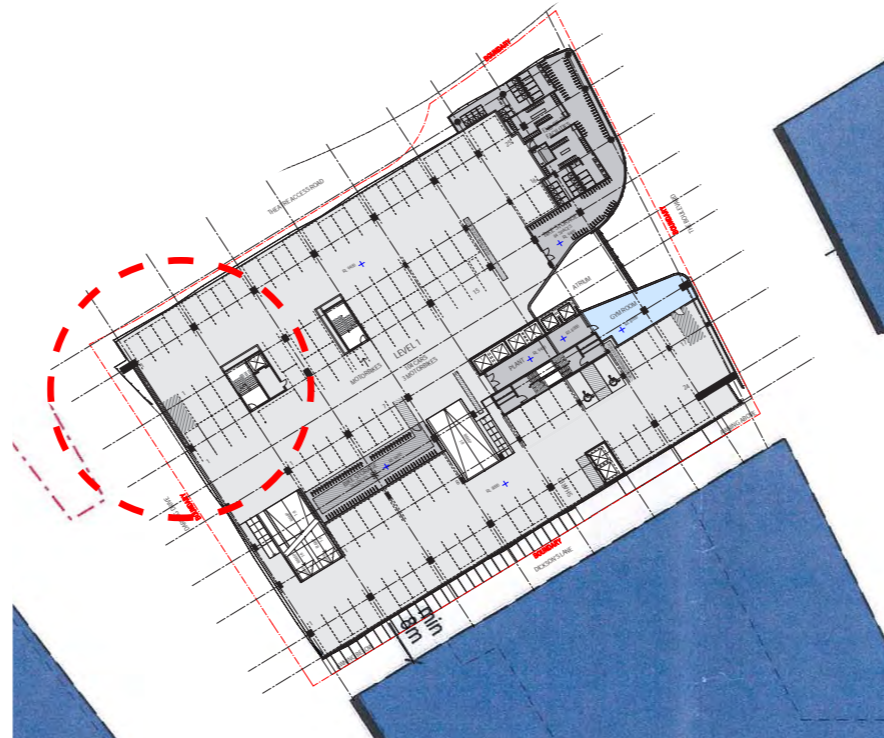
Section 96 NW Plot proposal with north western corner over the Parameter Plan envelope
